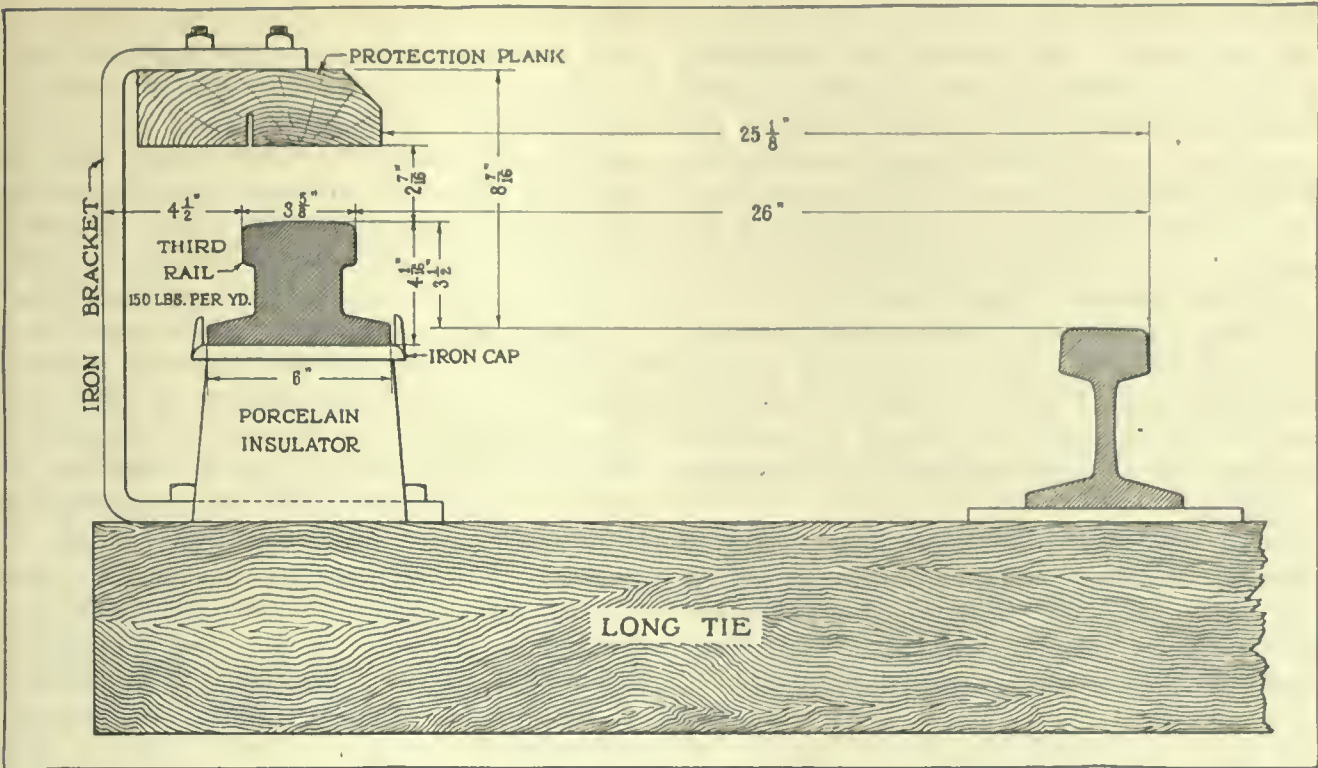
OVER RUNNING THIRD RAIL INSTALLATION. POSITION OF THIRD RAIL WITH REFERENCE TO TRACK RAIL, THIRD RAIL SECTION, AND PROTECTION PROVIDED
